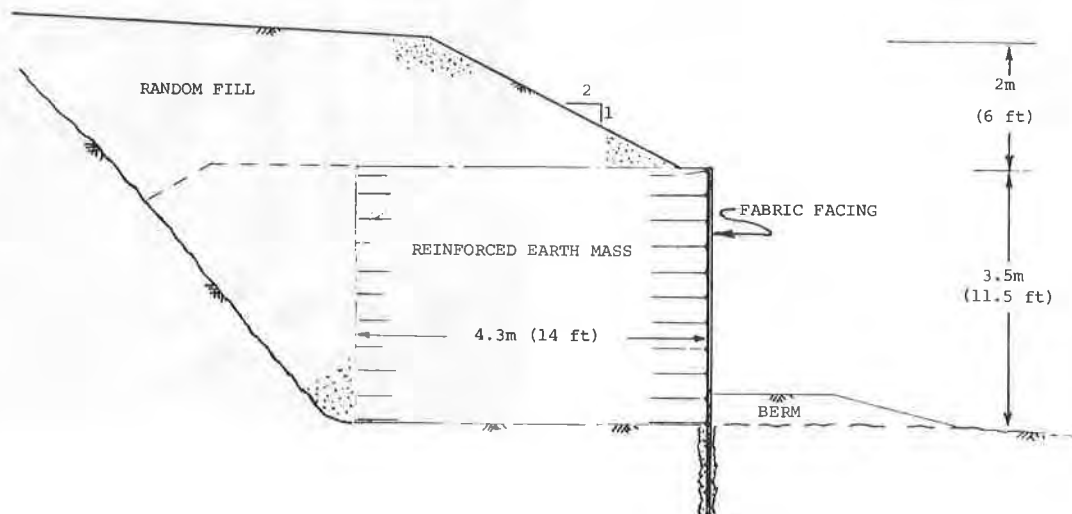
TYPICAL CROSS SECTION, TEST WALL NO.3
